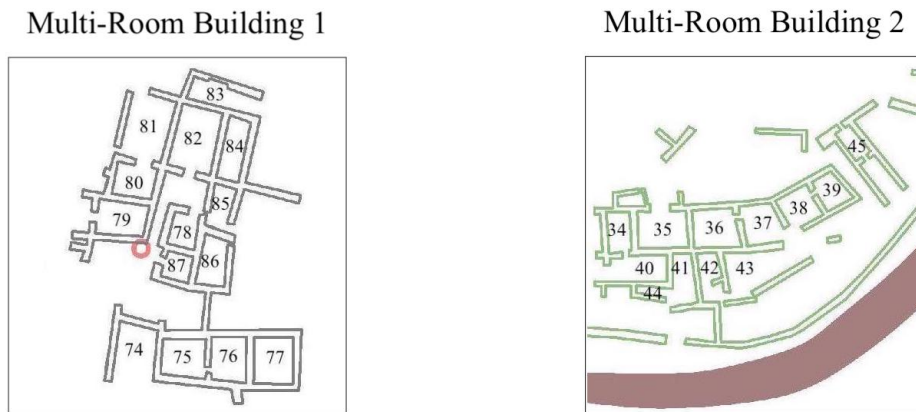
Different construction plans of Multi-Room Building 1 and Multi-Room Building 2
